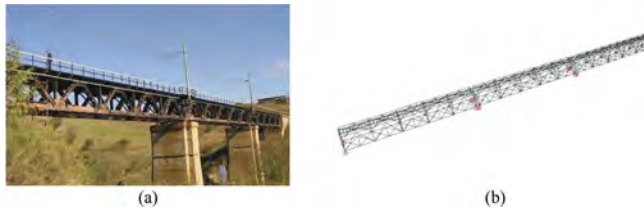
(a) View and (b) modelling of the selected case study (railway bridge over “Gesso” torrent).
